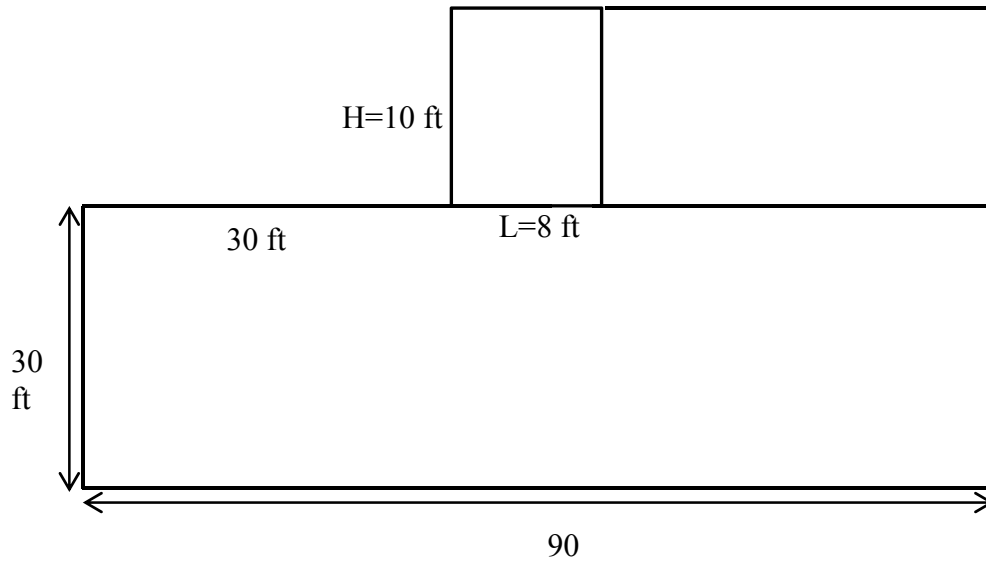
MSE Wall with 10 ft Wall Height and No Back Slope.
